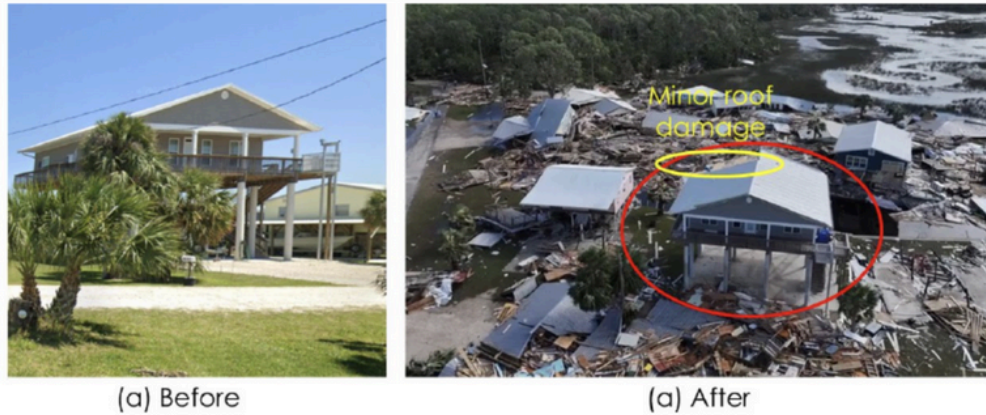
Damage to non-structural elements at ground floor of elevated buildings in Siesta Keys, FL (Source: Christian Casale)
